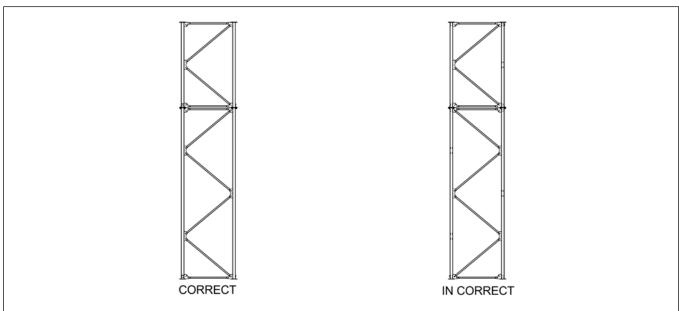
Stacking the 2-leg tower sections (Warren Bracing)
